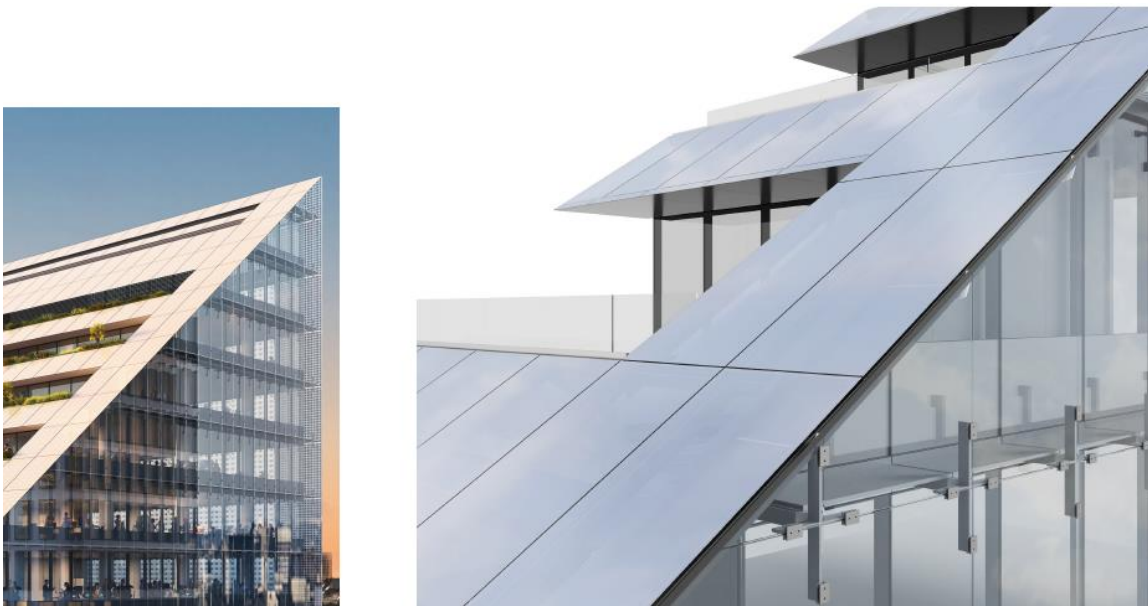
Building C (Central workplace) upper level detail to east and west facades
